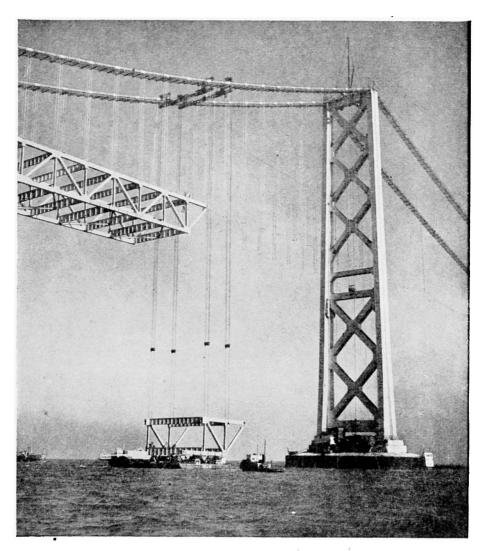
San-Francisco-Oakland Bay Bridge. Erection of heavy units of deck steelwork
